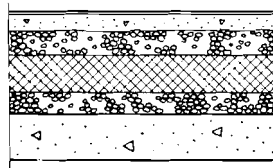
Gravel macadam roof with ventilated gravel section on structural concrete slab; then a heat insulating material and another ventilated gravel section on the top of this (patented design).
